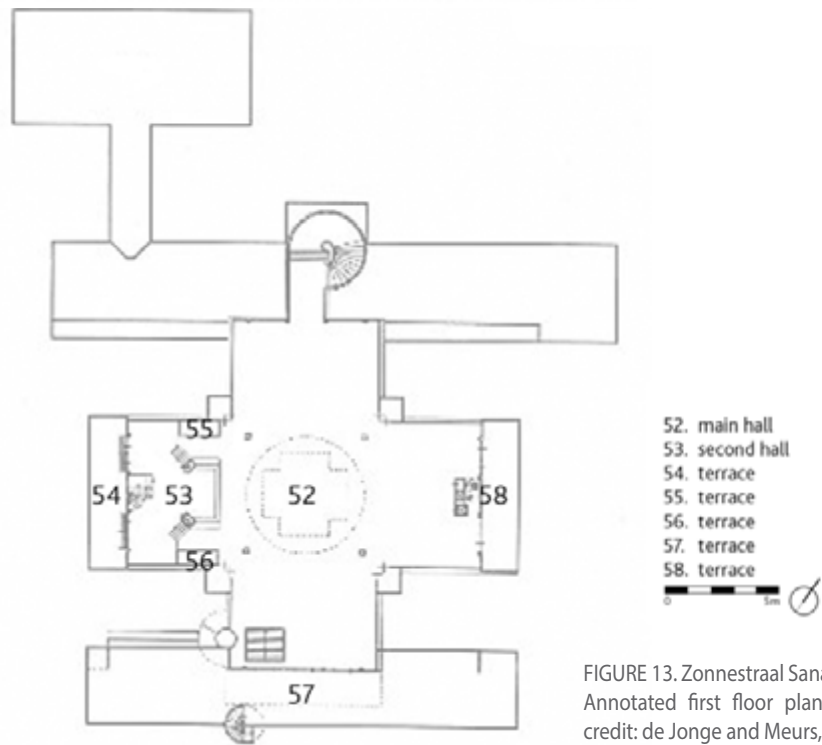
Zonnestraal Sanatorium: Annotated first floor plan. Image credit: de Jonge and Meurs, 2010.
